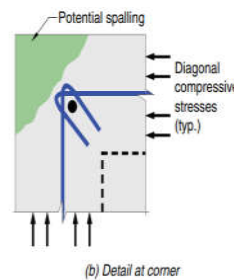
Spalling of corners of beams subjected to torsion.
